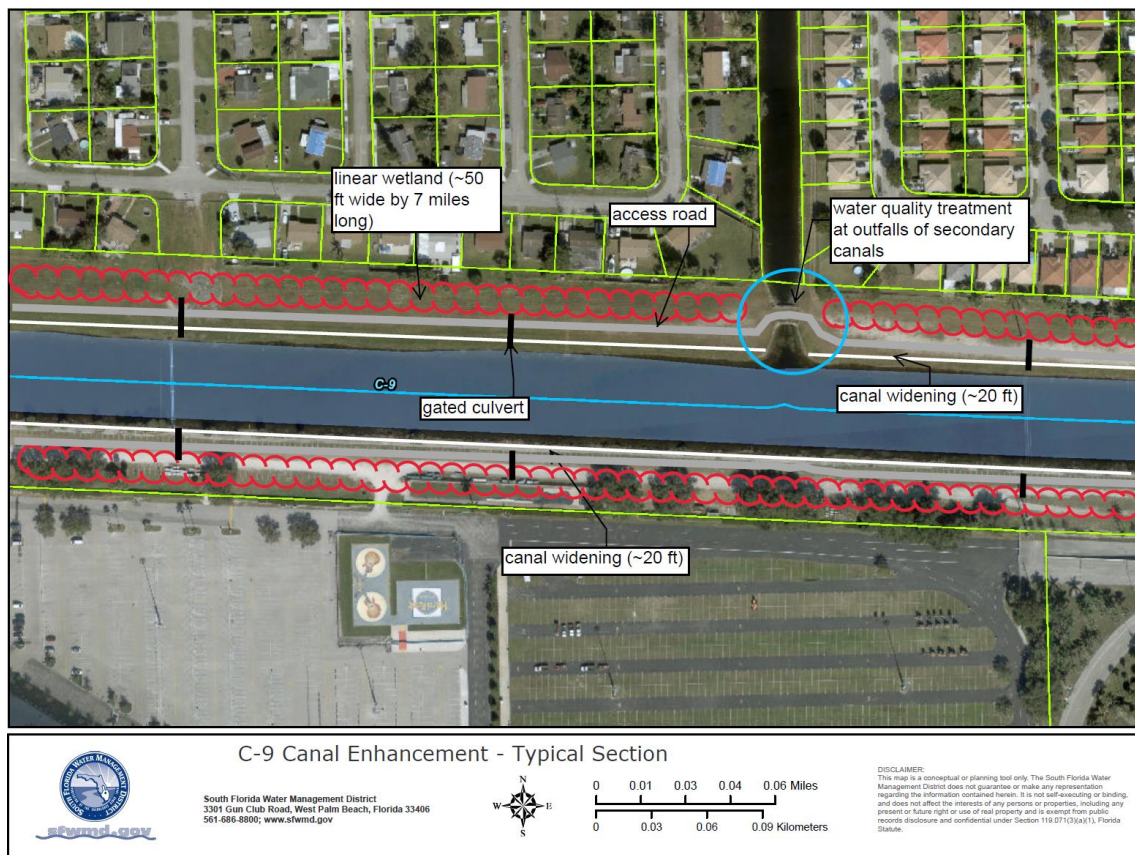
Typical section of the C-9 Canal Enhancement project showing potential project features
